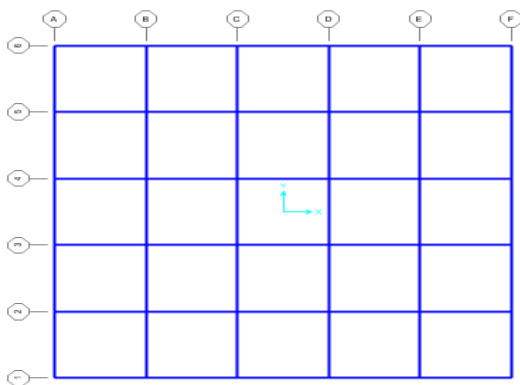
Typical Floor Plans Of 3 Storey And 9 Storey Building
